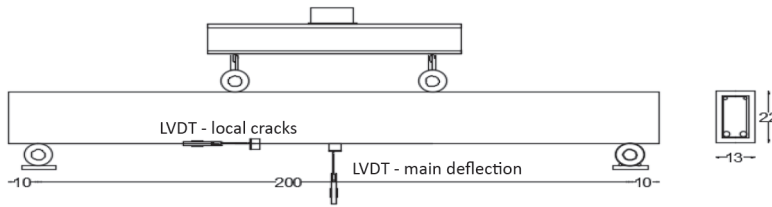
Beam details, instrumentation and geometrical parameters of concrete beams
